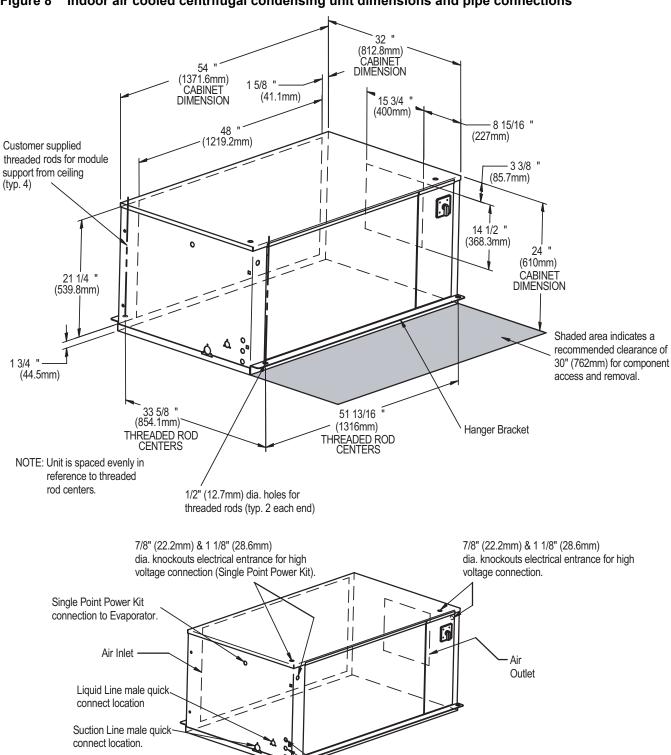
Indoor air cooled centrifugal condensing unit dimensions and pipe connections
